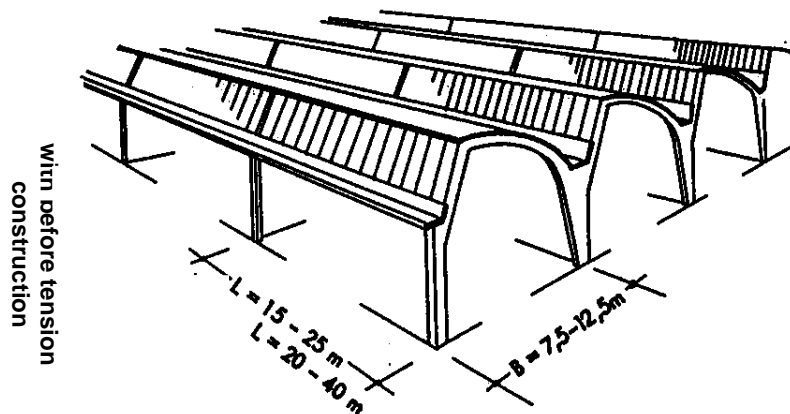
A saw tooth roof with suitable window band, each unit is individually supported
